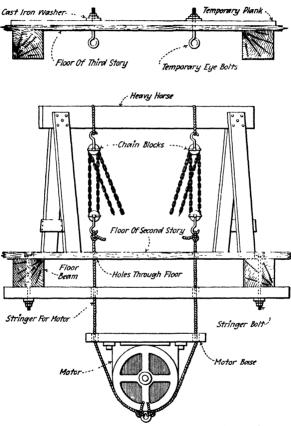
Elevation of hoisting arrangement for raising an inverted motor up to stringers bolted to a ceiling beam.
